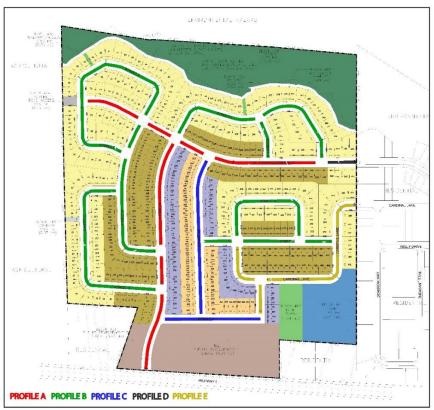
Street Profiles Key Map 20 METRE STREET PROFILE OPTIONS
